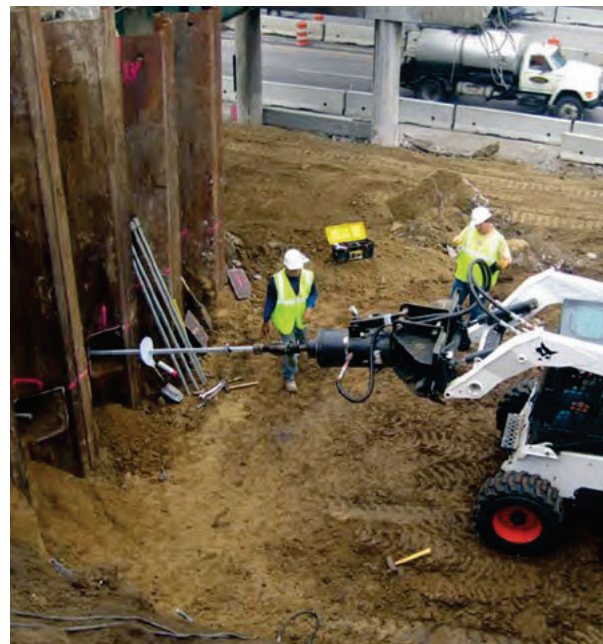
Sheet-pile wall stabilization with helical tiebacks
